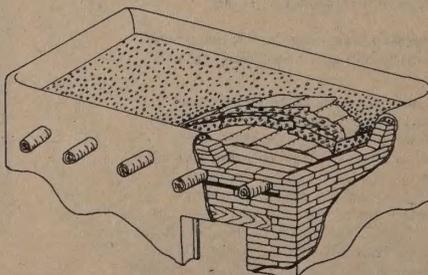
The cutaway section of this bunker fill roof shows the layered structure of the roof. From the top down, the components are gravel and asphalt, building paper, earth fill, building paper, wood sheathing and supporting beams (vigas).
